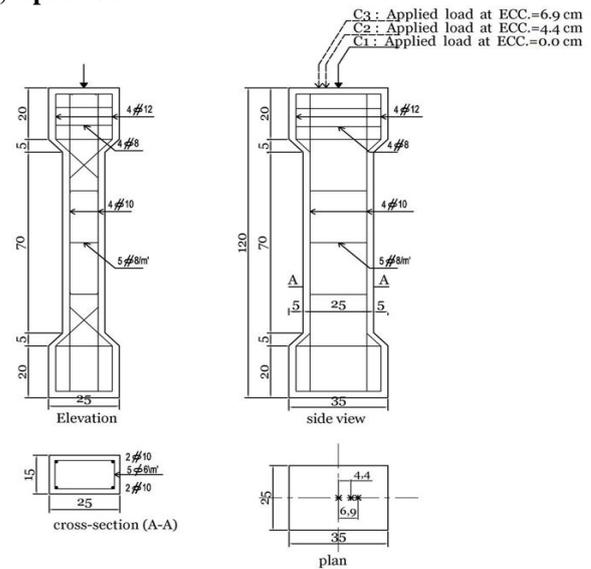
Typical dimension and reinforcement of columns C1, C2, C3
